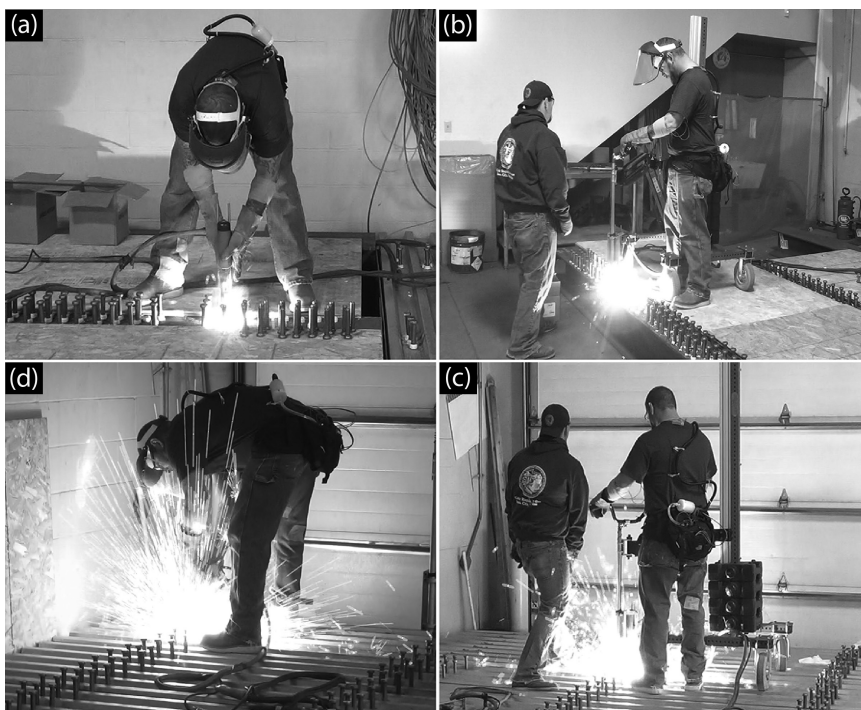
Stud welding simulations. Clockwise from upper left: (a) welding to bare beam using conventional equipment, (b) welding to bare beam using prototype upright system, (c) welding through deck using prototype upright system, and (d) welding through deck using conventional equipment.
